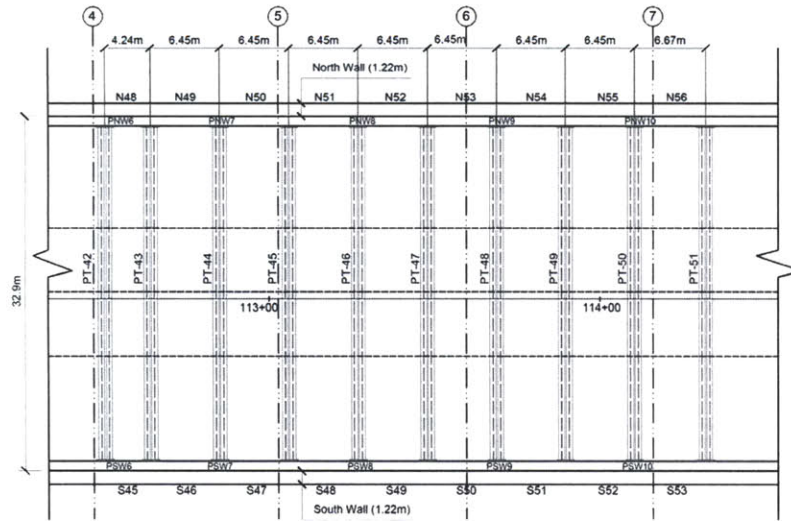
Instrumentation location plan of Platform section of Courthouse Station (after PB, 1998)
